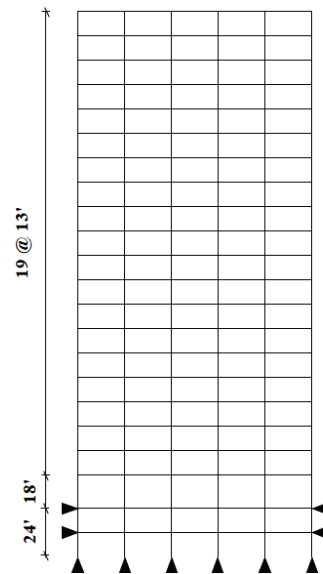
Baseline SDC B_{\max} steel moment frame building typical 20-story elevation.
